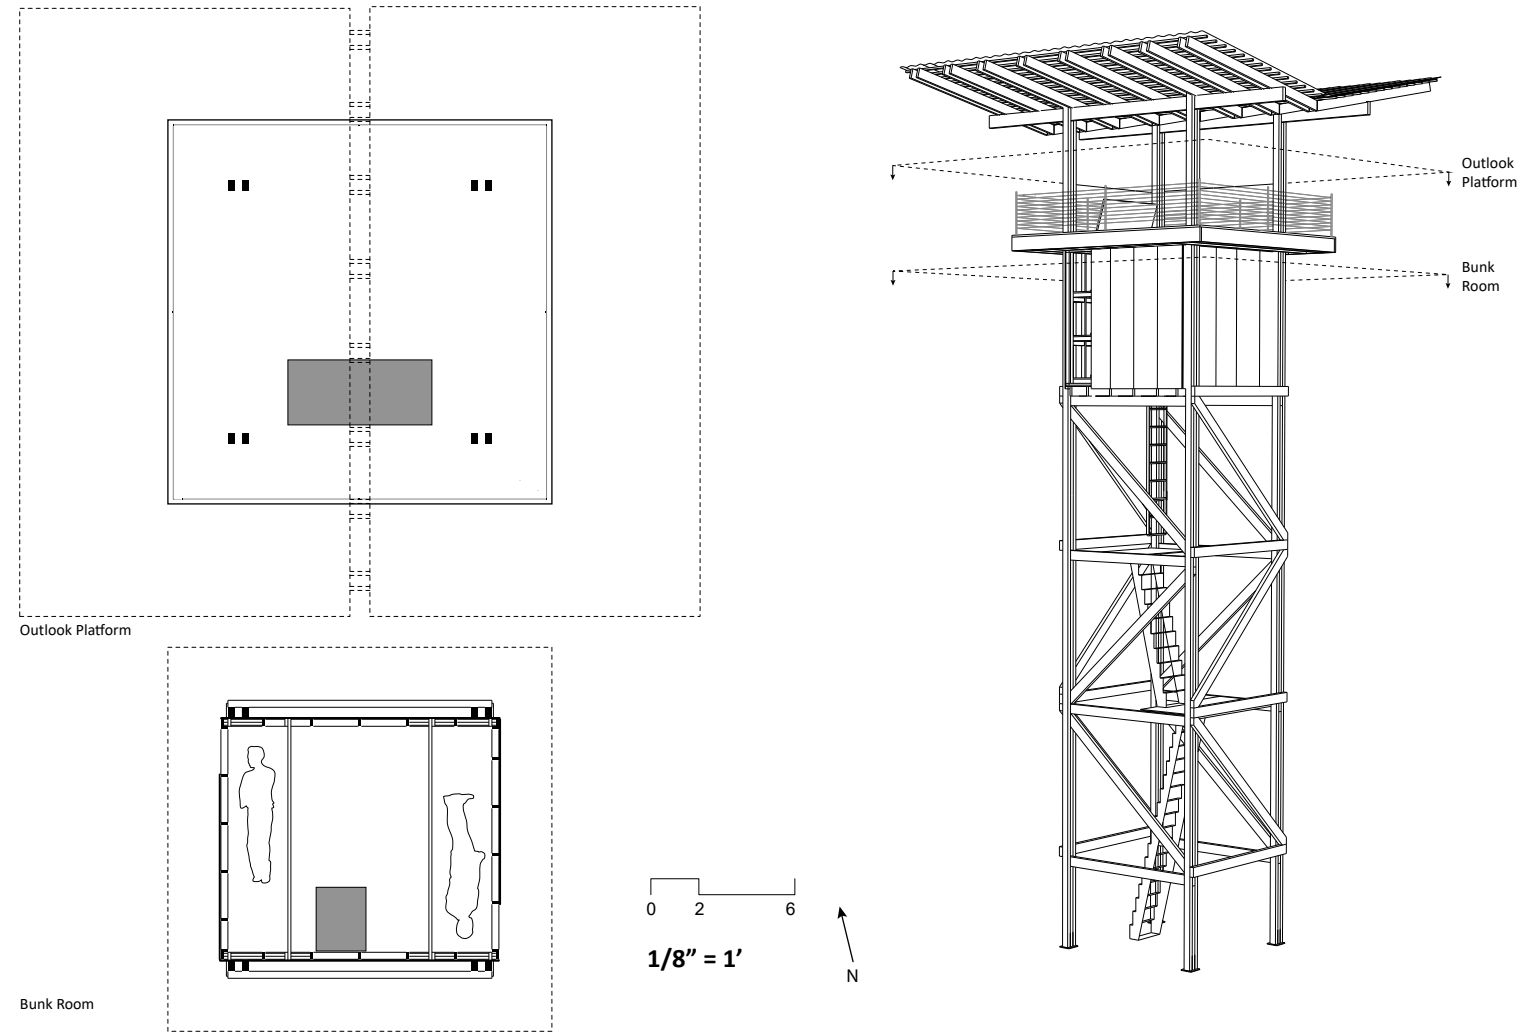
(above): Plan showing semi - enclosed bunk room and overlook platform
